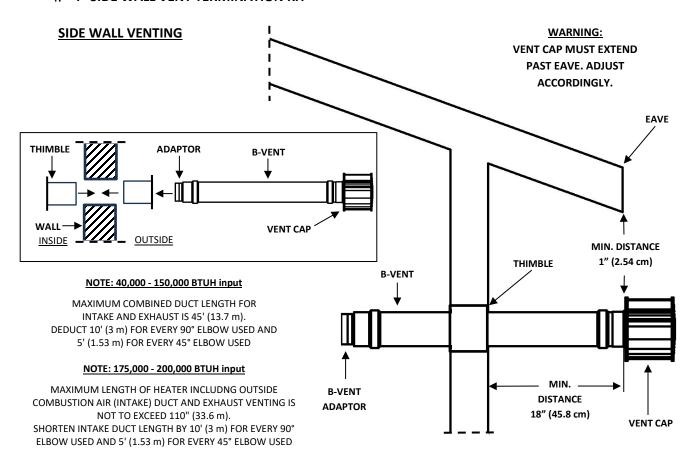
SIDE WALL VENT TERMINATION KIT INSTALLATION
